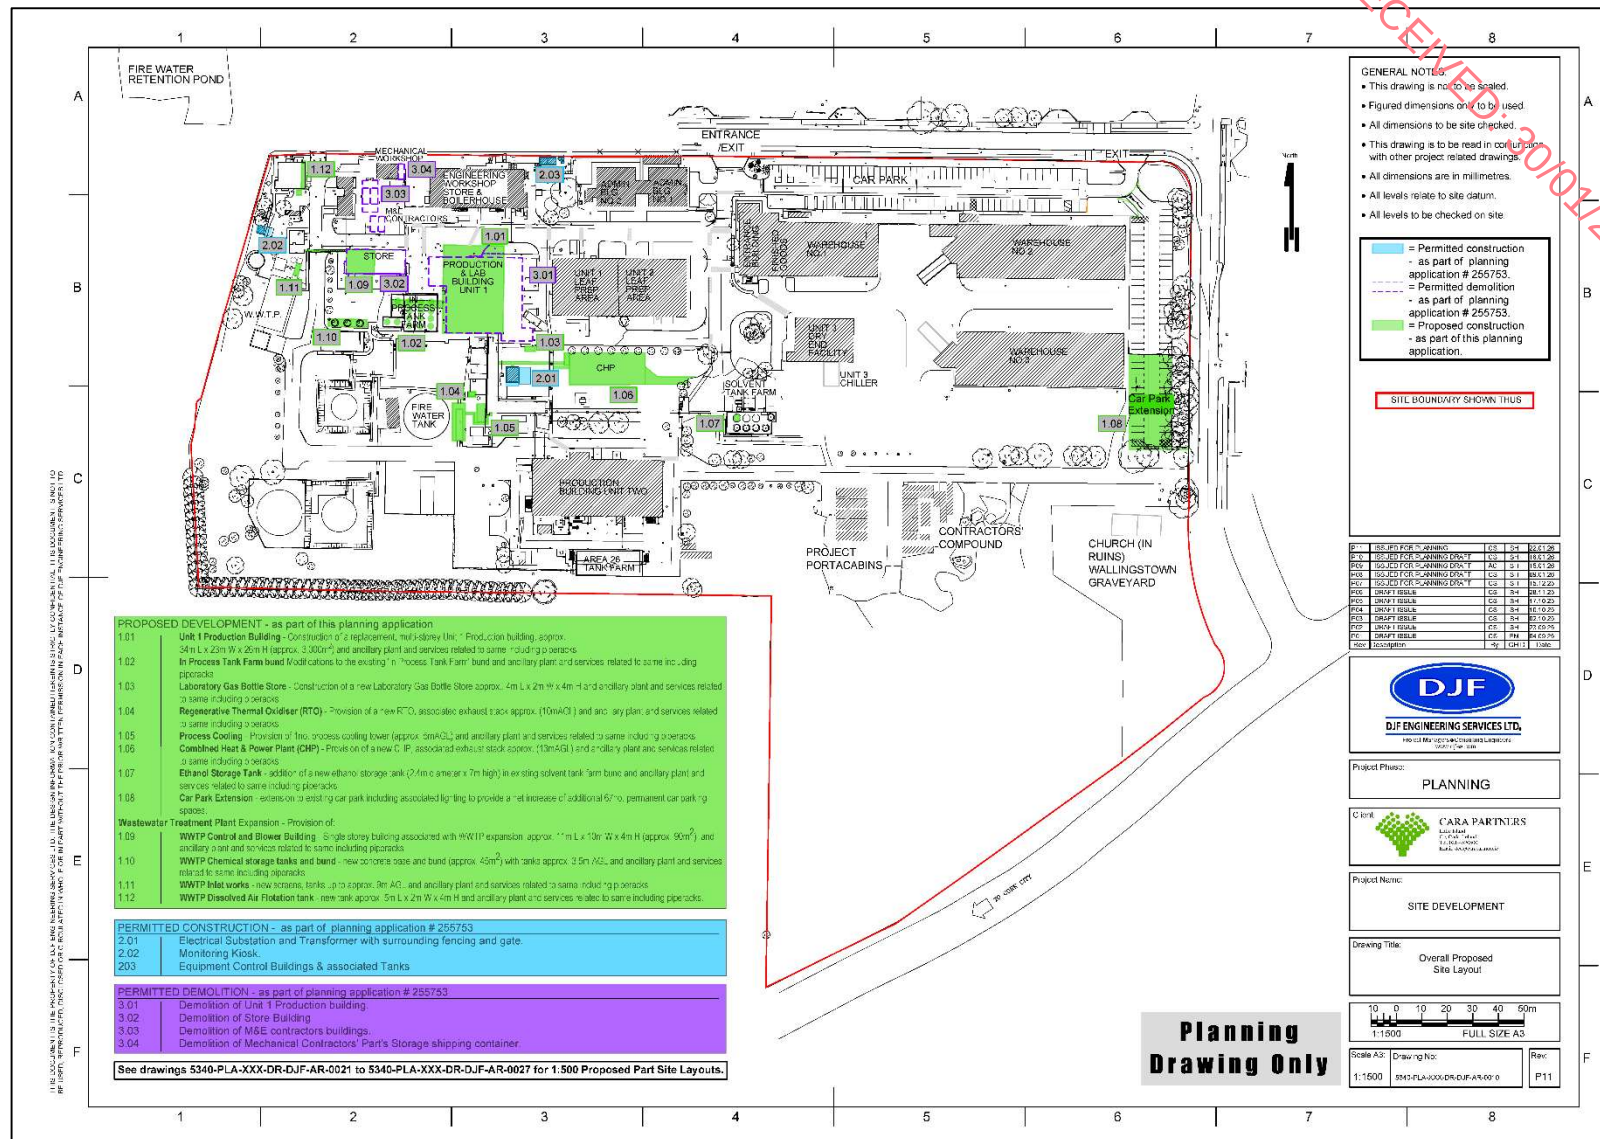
Proposed site layout drawing (ref. Drg. No. 5340-PLA-XXX-DR-DJF-AR-0010).
